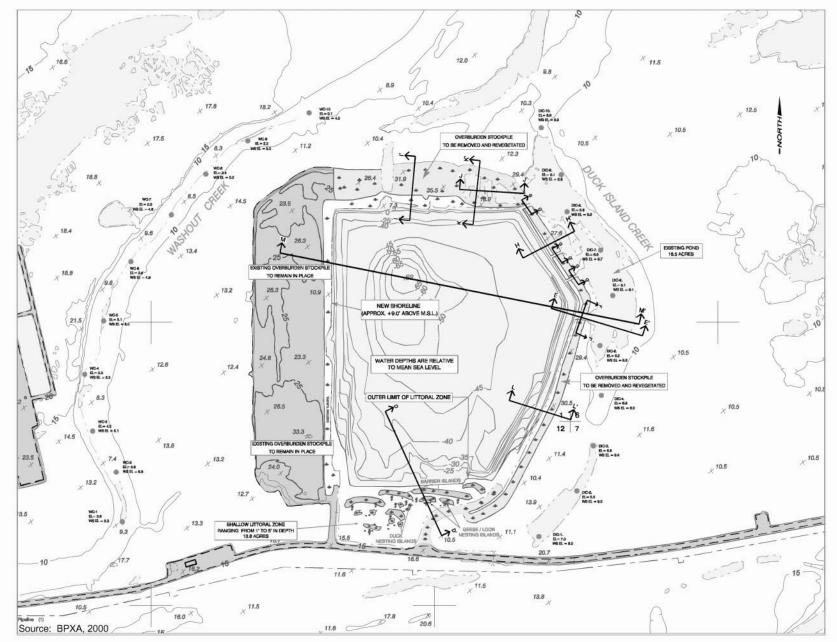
Duck Island Mine Site - Proposed Restoration - Plan View
